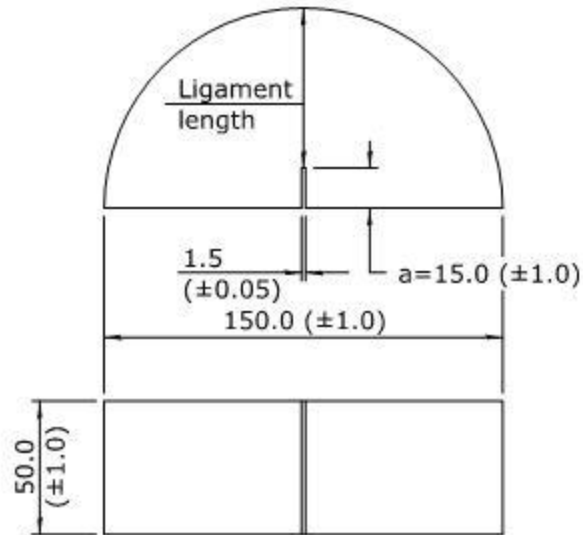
I-FIT Test Specimen Illustration (IDOT, 2016)
